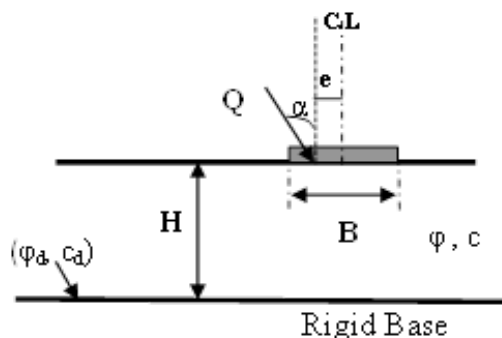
Strip footing under eccentric and inclined loading based on a thin layer soil.
